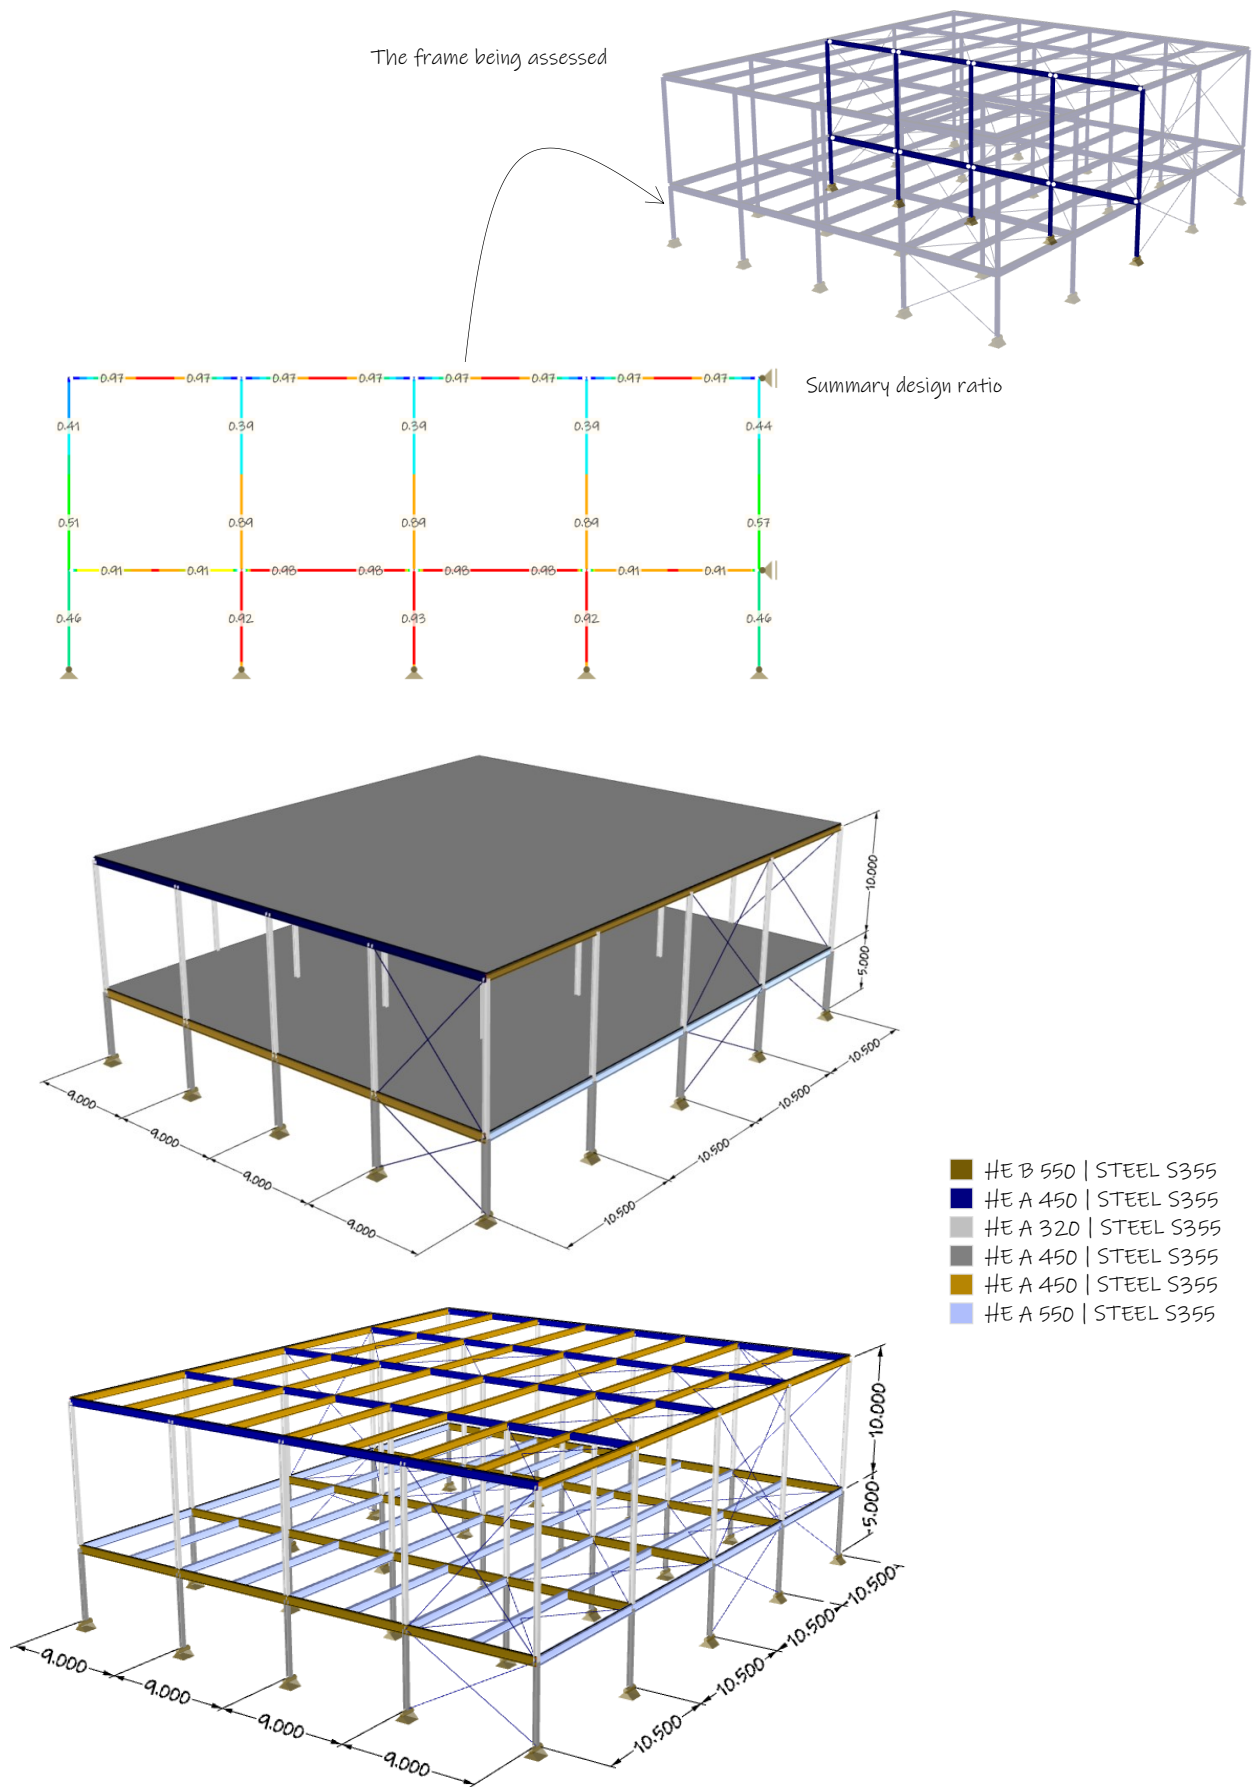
Summary DA06 main frames' design ratios in 2D and a comprehensive 3D overview of the structural system, highlighting the load-bearing elements and cross-sections of DA06's demountable scalable design.
